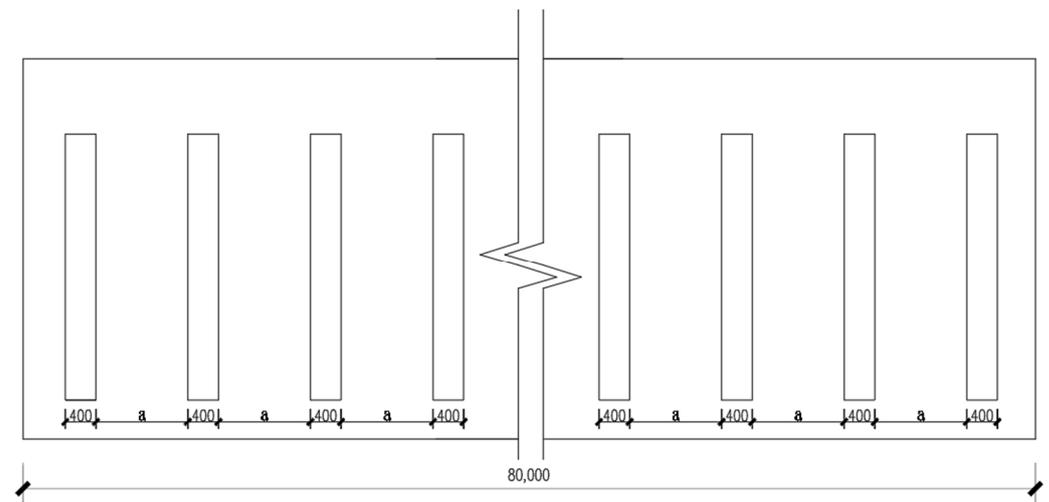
The top-view design of the double-slope greenhouse shade room roof windows.
